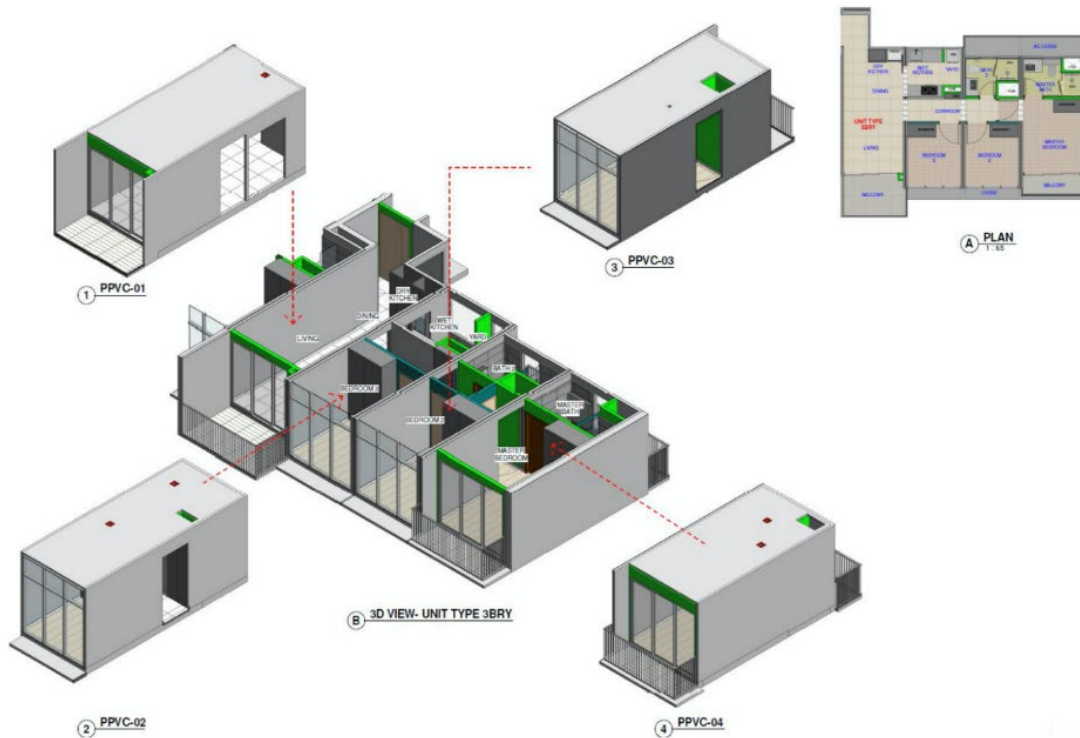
Example of digital model of modular, prefabricated and completed large-space parts of the suite for later assembly. [34]
